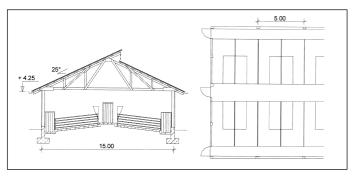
Section and ground plan for keeping fattening pigs on sloped floor
